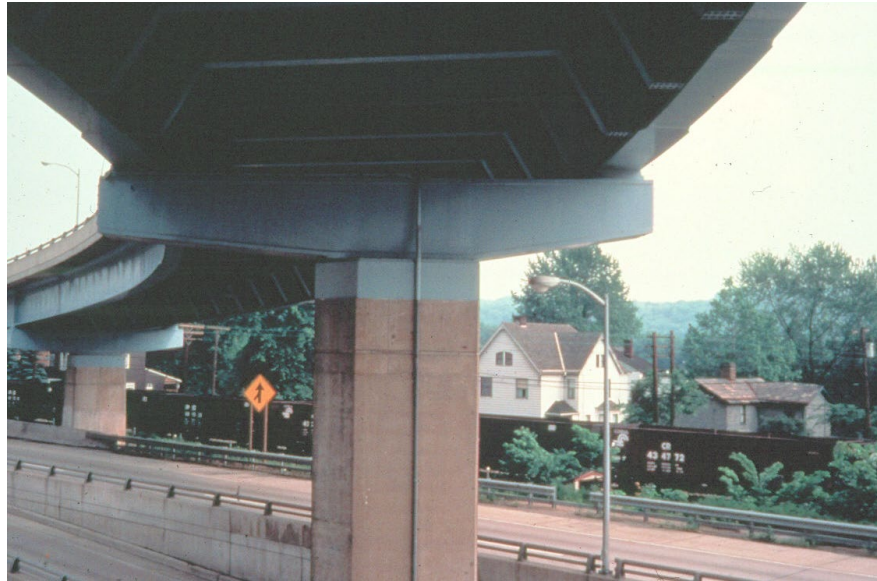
Combination: Reinforced Concrete Column with Steel Pier Cap
